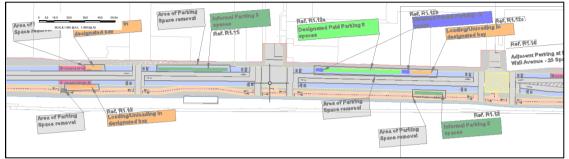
Proposed scheme design and parking changes along North Wall Quay (between New Wapping Street and Tom Clarke Bridge roundabout).
